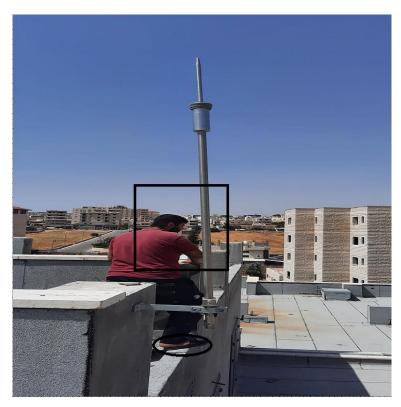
13: Worker installing the Thunderbolt on the roof of the building ³⁹⁸
